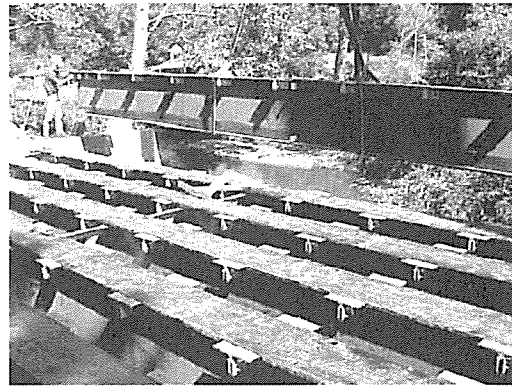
Installation of FRP Double web pultruded girders on Rt. 601 bridge (photo: Strongwell)
